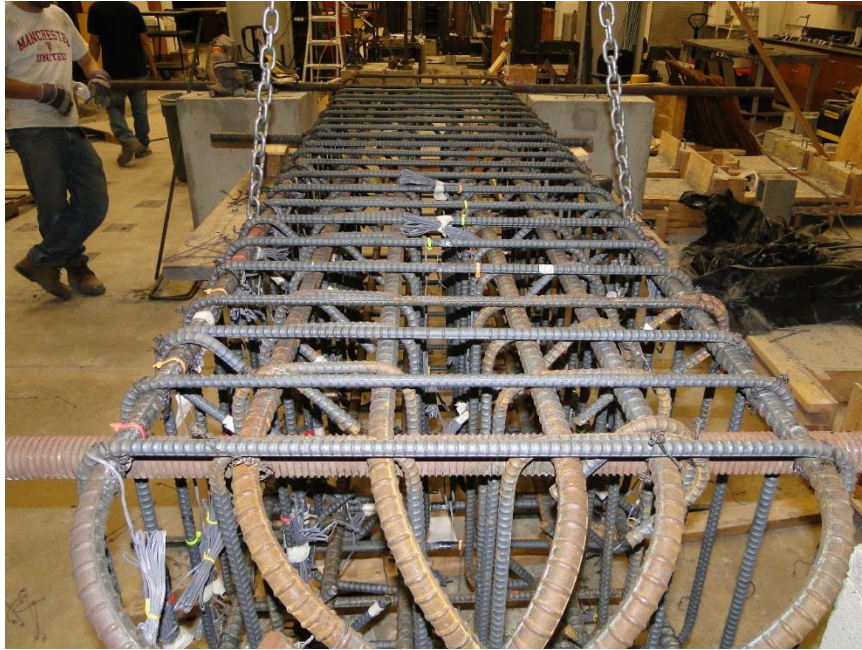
Reinforcement Details for Space Frame (SF) Column Specimens
